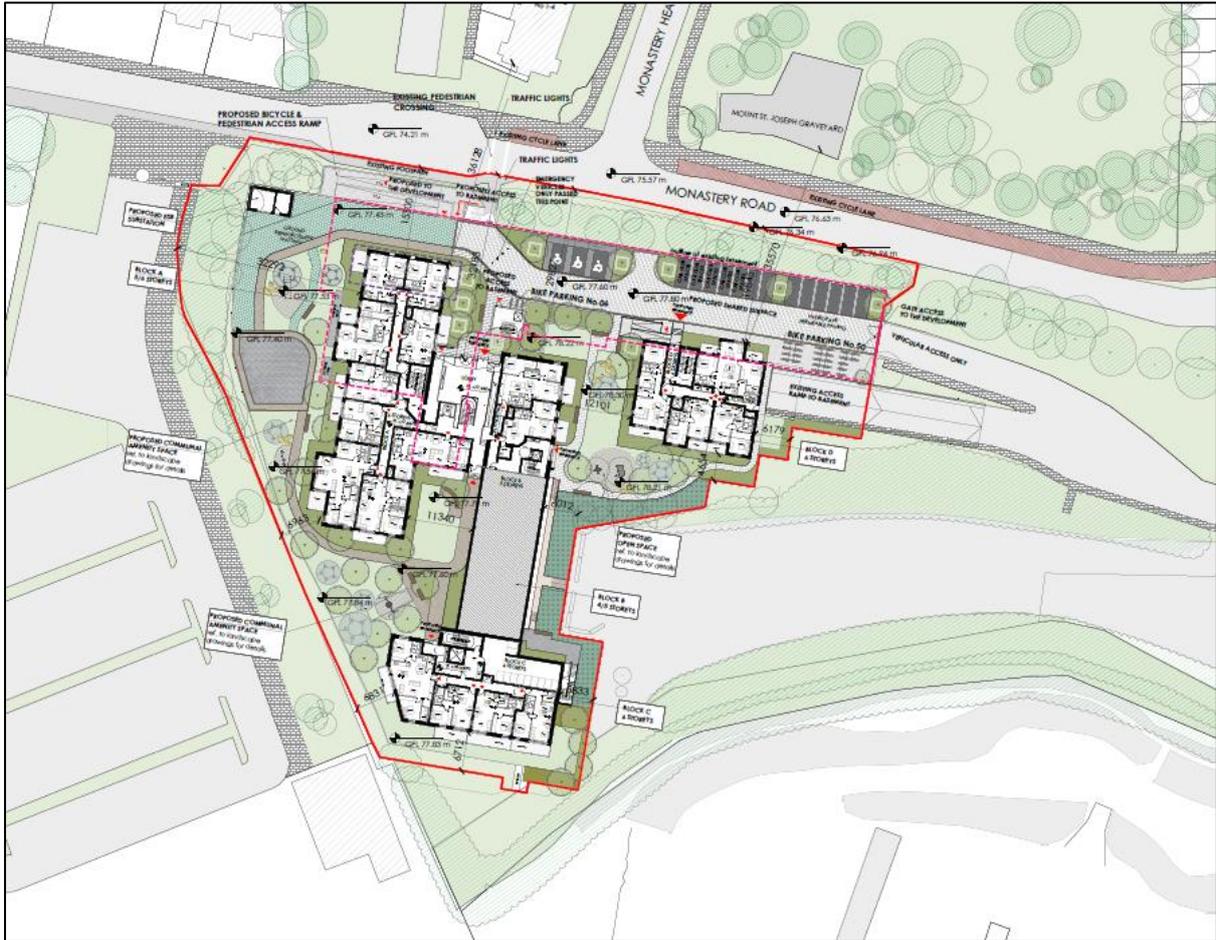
Proposed Site layout plan Option B (no footpath)
